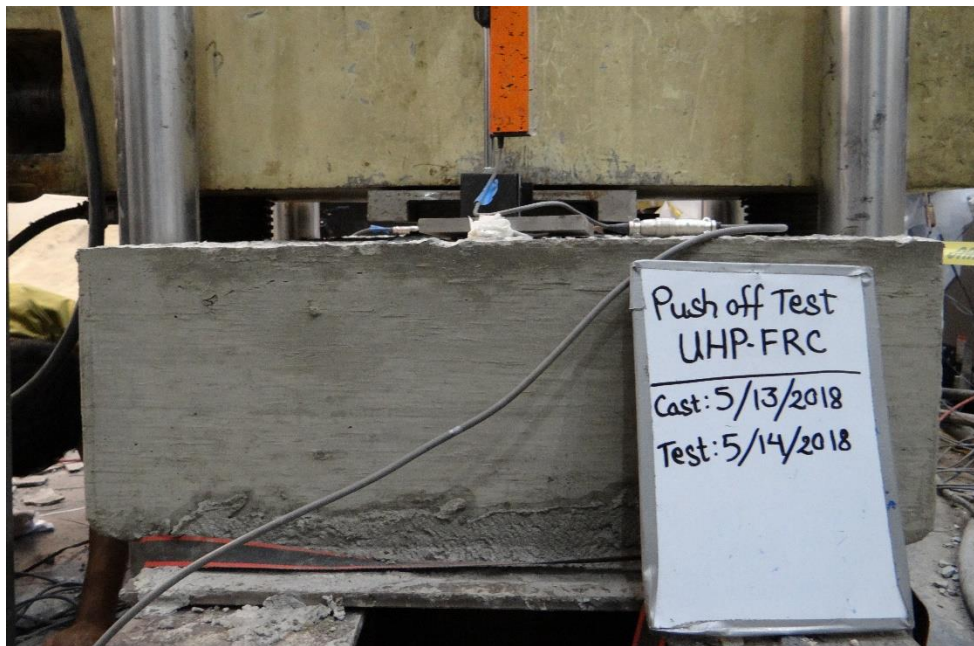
23 Punch test setup for specimen with UHP-FRC precast slab and cast-in-place joint.
